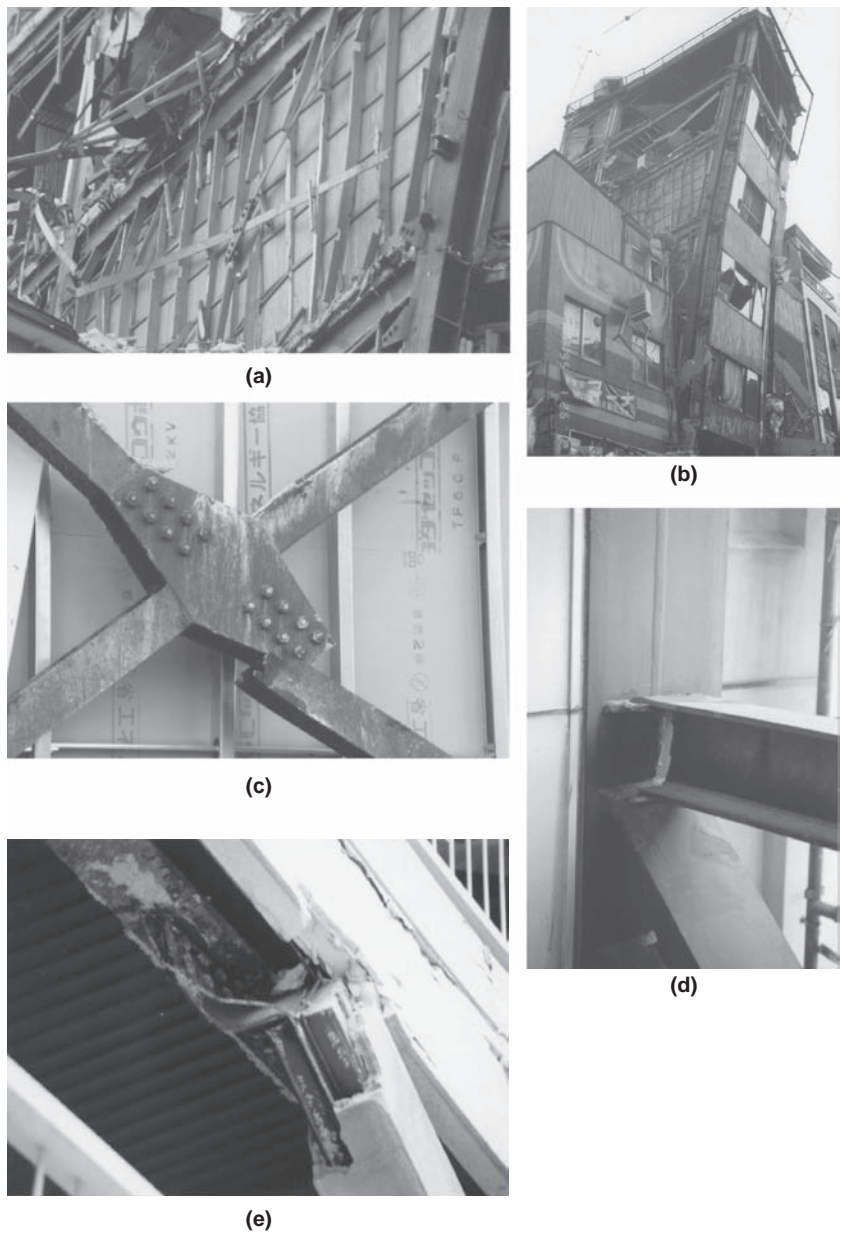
Undesirable failure modes in concentrically braces frames: (a) net section fracture of flat-bar brace; (b) global view of same building; (c) net section fracture of W-shape brace; (d) beam weld fracture; (e) gusset buckling and fracture.
